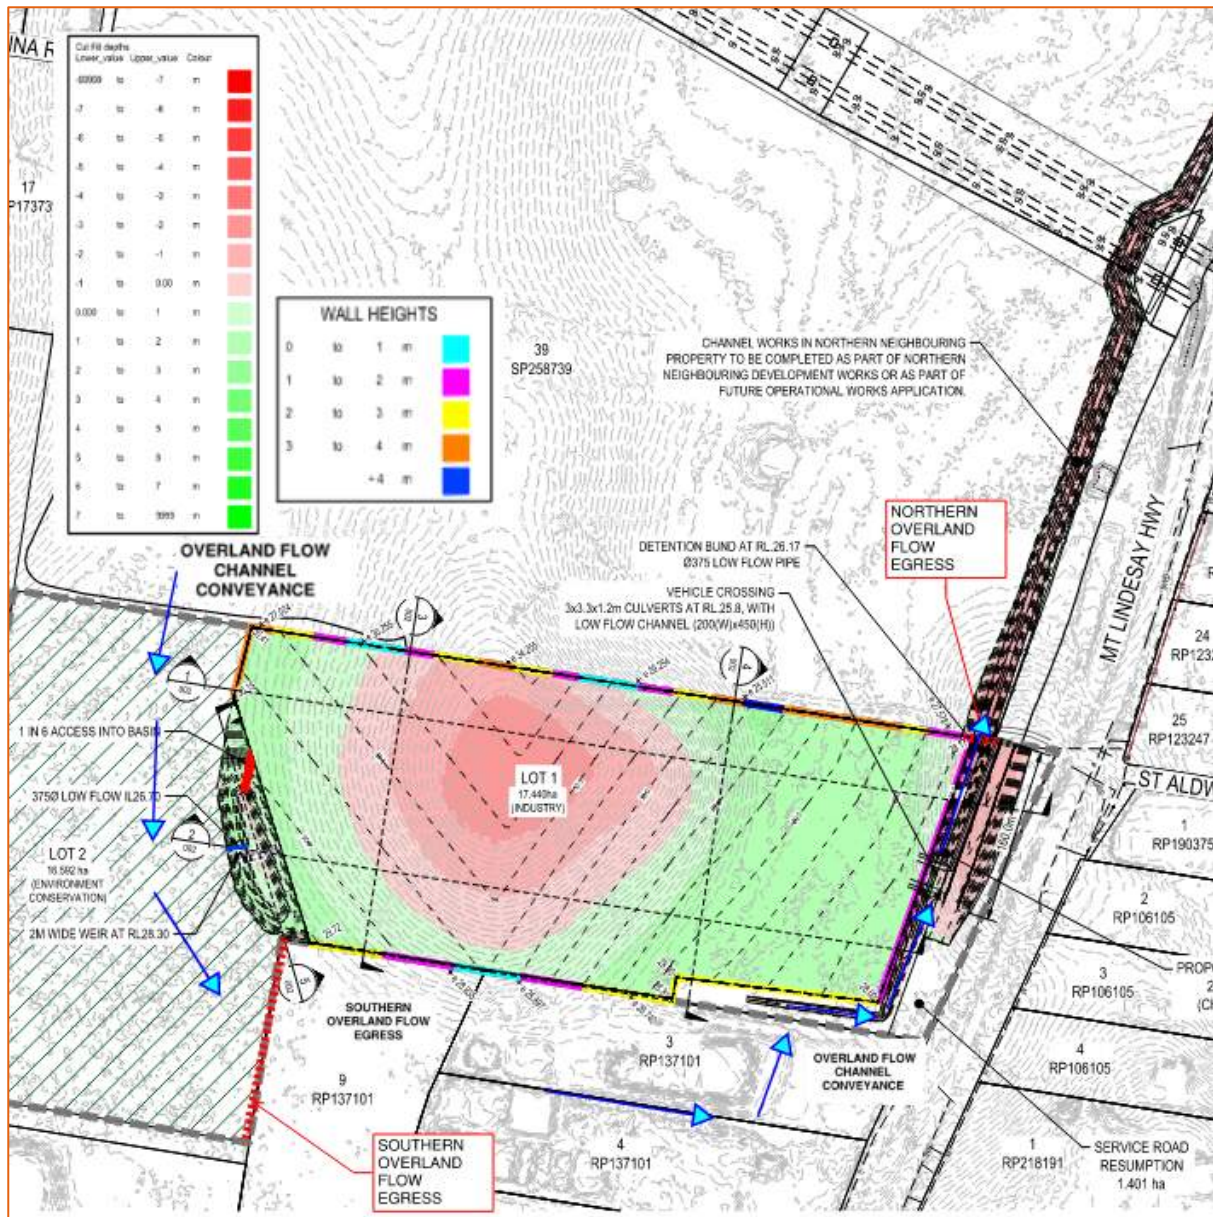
Concept Proposed Bulk Earthworks Layout
